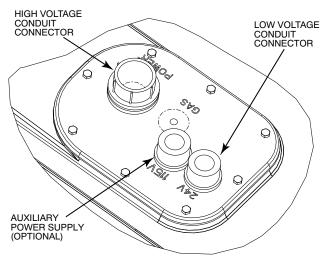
Thru-the-Base Fitting Assembly (Shown in Shipping Position)
